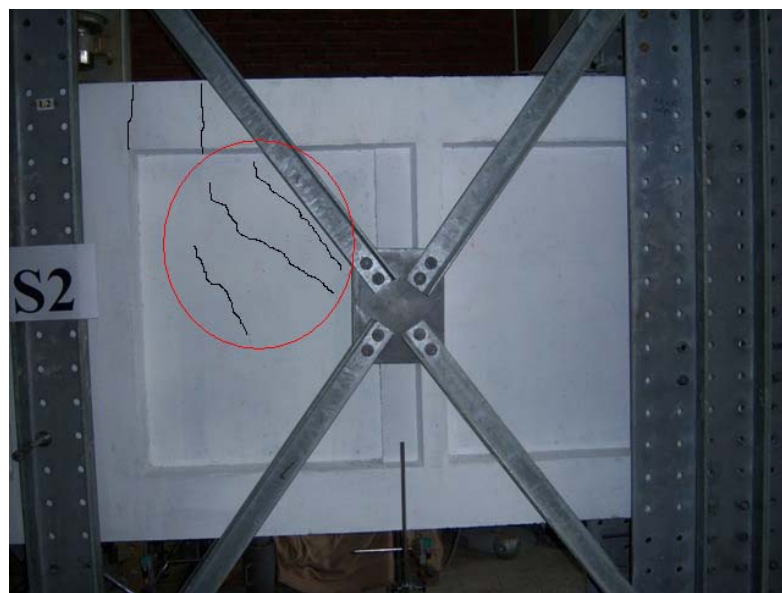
Diagonal Cracks on the First Story Infill Wall
